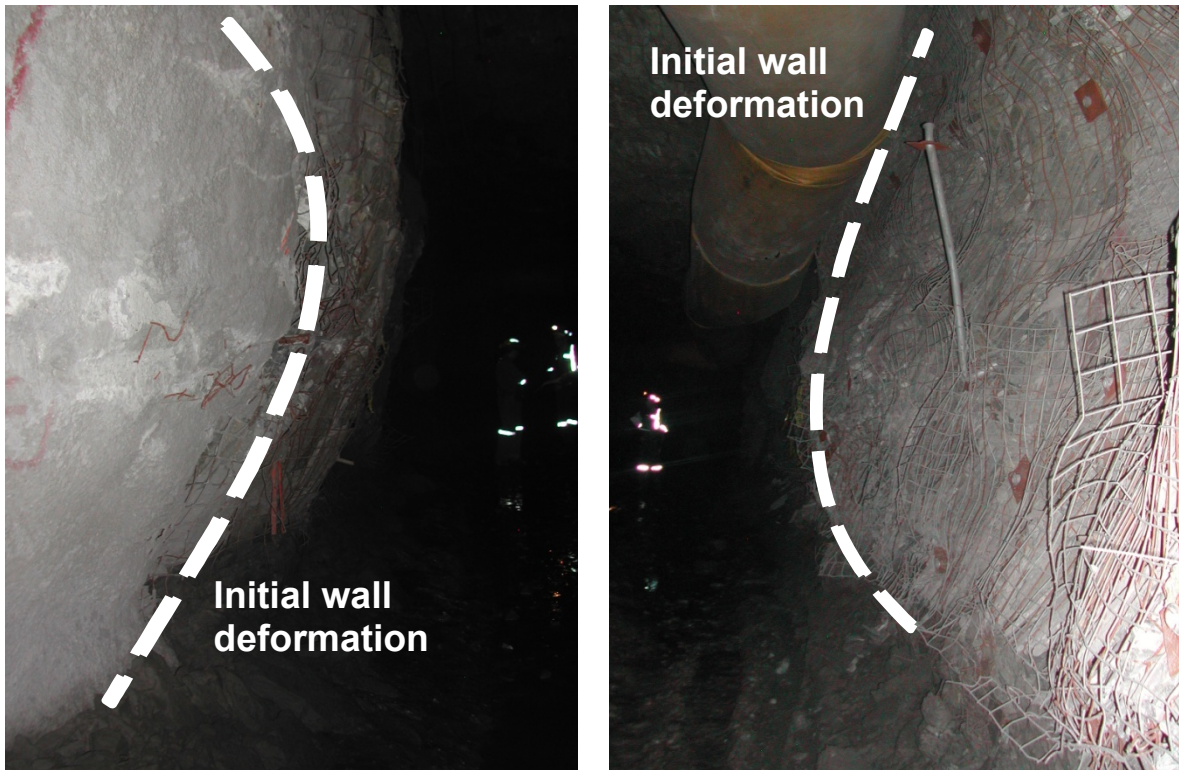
Hanging wall (left) and footwall (right) of drift 233-41-W (LaRonde mine, March 2008)
